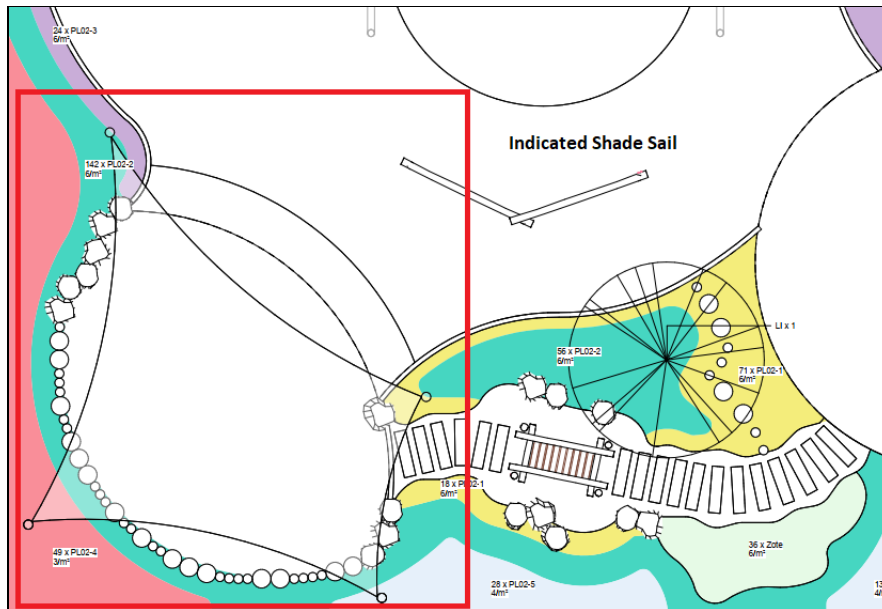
Shade sail located in the south western corner outlined in red Source: TKD Architects
